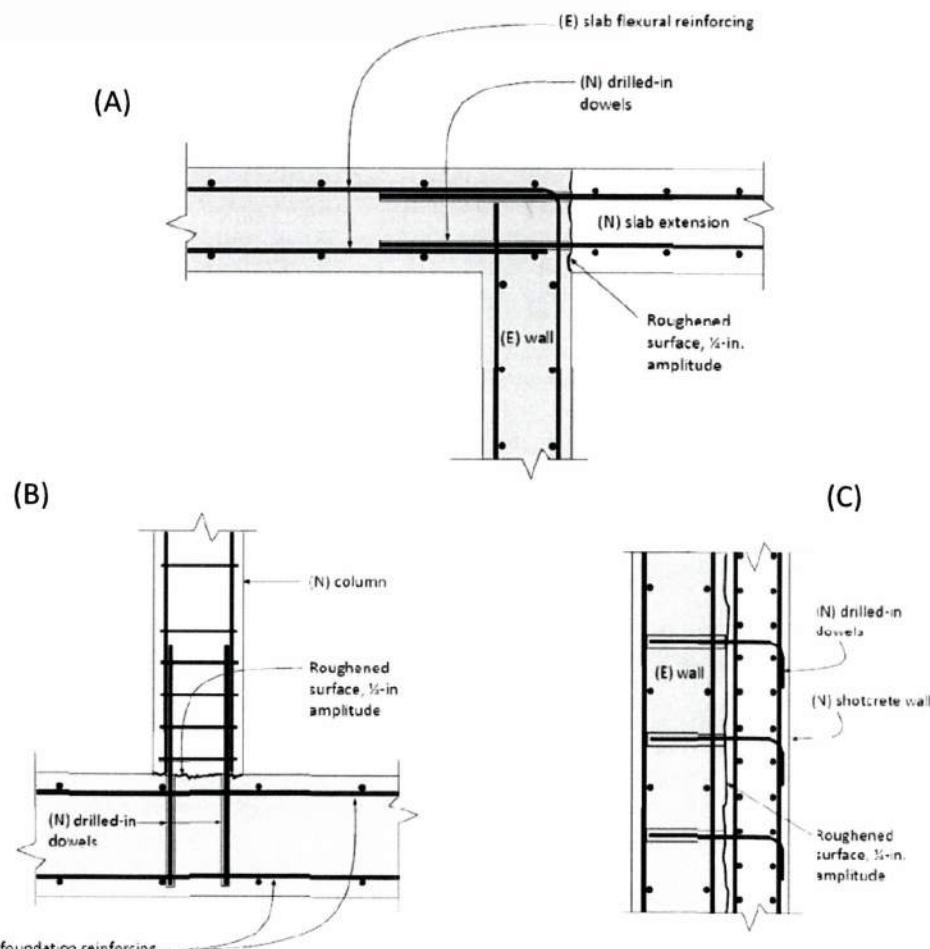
APPLICATION EXAMPLES FOR POST-INSTALLED REINFORCING BARS:
